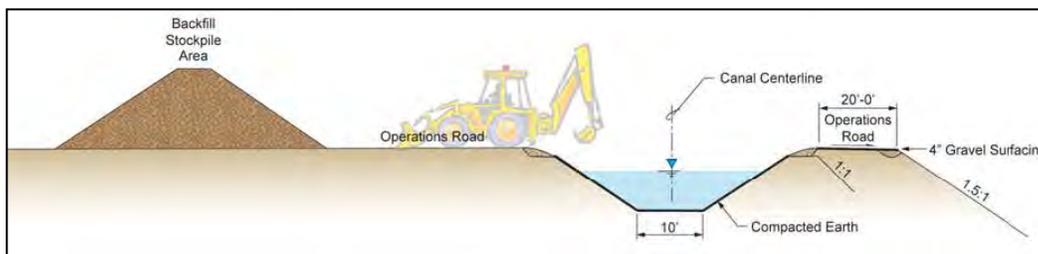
10. Existing East Low Canal—Typical Cross-Section
